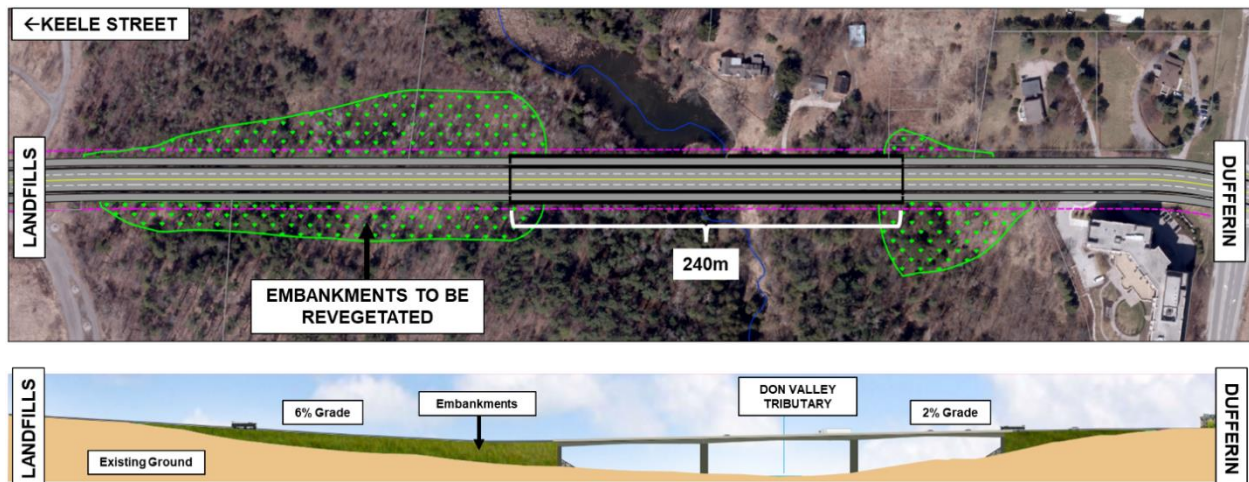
Section 3, Alternative 3: Triple Span Bridge
